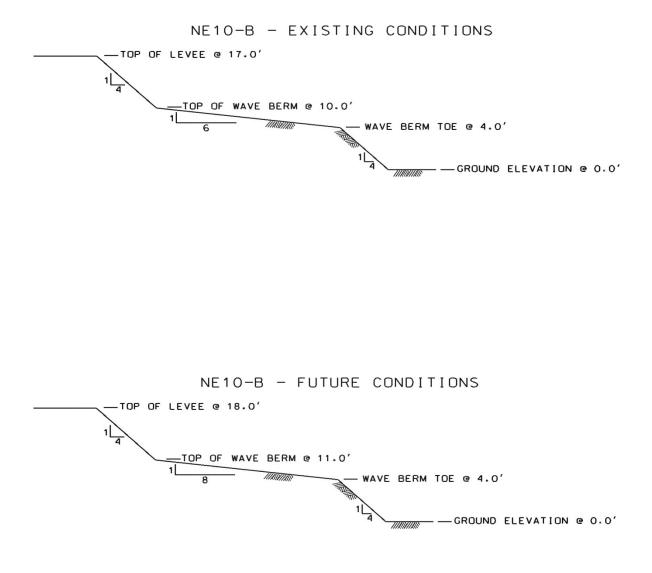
Typical Levee Design Cross-sections South Point to Hwy 90 Levee (NE10-B)
